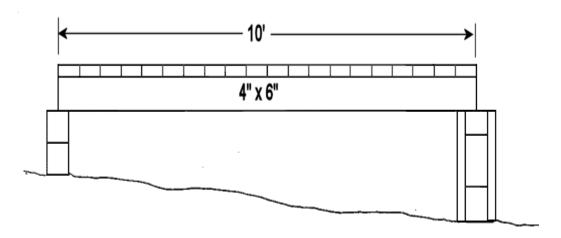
Boardwalk Section Depicting Decking, Stringers & Sills
